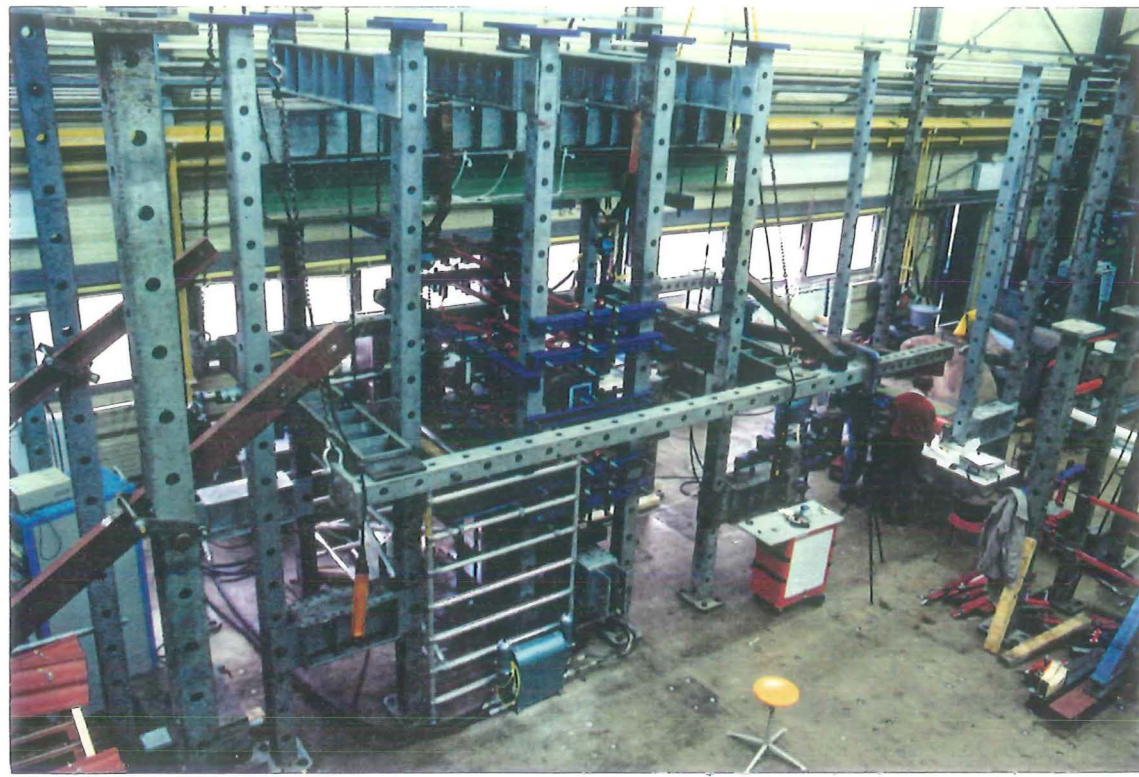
Test rig for connections with axially loaded plates and beams in CHS and RHS columns (series 1 and 2)
